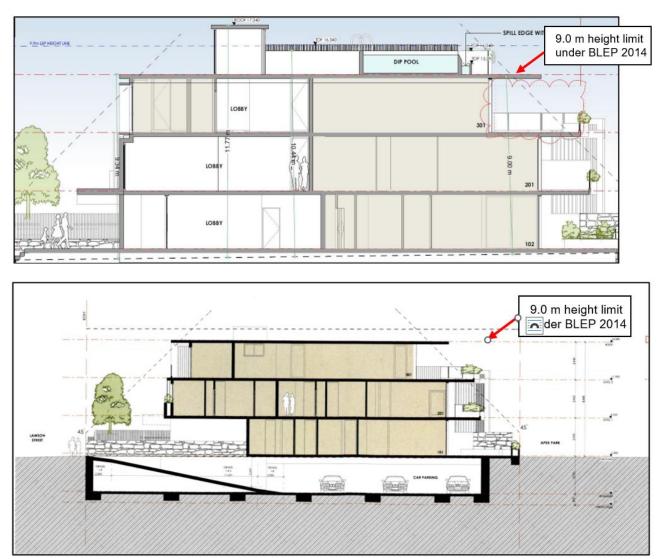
Proposed modification to building section (top) comparison with approved building (bottom)
